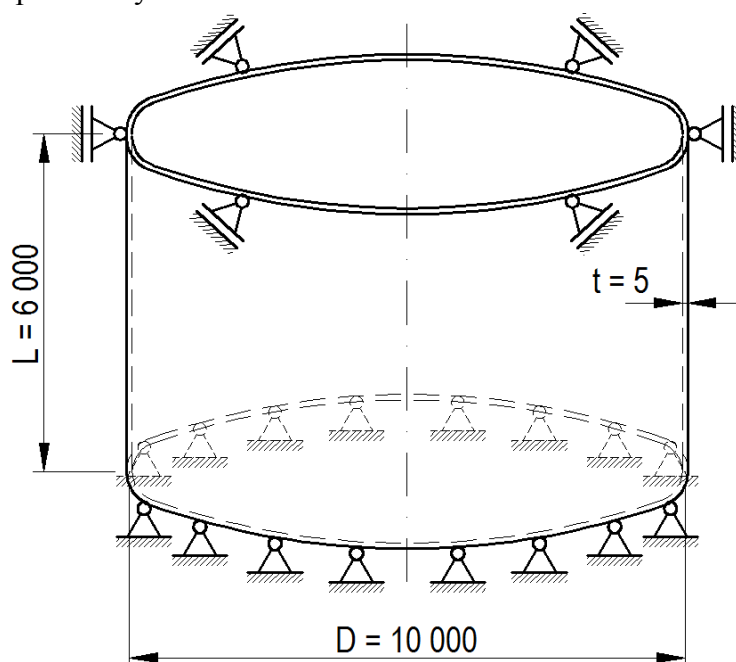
Cylindrical steel shell. Dimensions and supporting conditions
